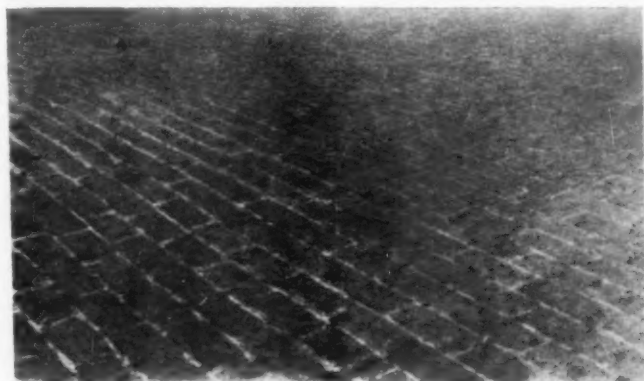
DETAIL VIEW OF $2\frac{1}{2}$ -INCH BRICK LAID DURING 1919 ON MAIN STREET, TONKAWA, OKLA. THE PHOTOGRAPH SHOWS THE CONDITION OF THIS PAVEMENT IN FEBRUARY, 1926. IT WAS LAID ON A 4-INCH MORTAR (1:4) BASE AND $1\frac{1}{2}$ -INCH SAND BEDDING WITH GROUT FILLER
